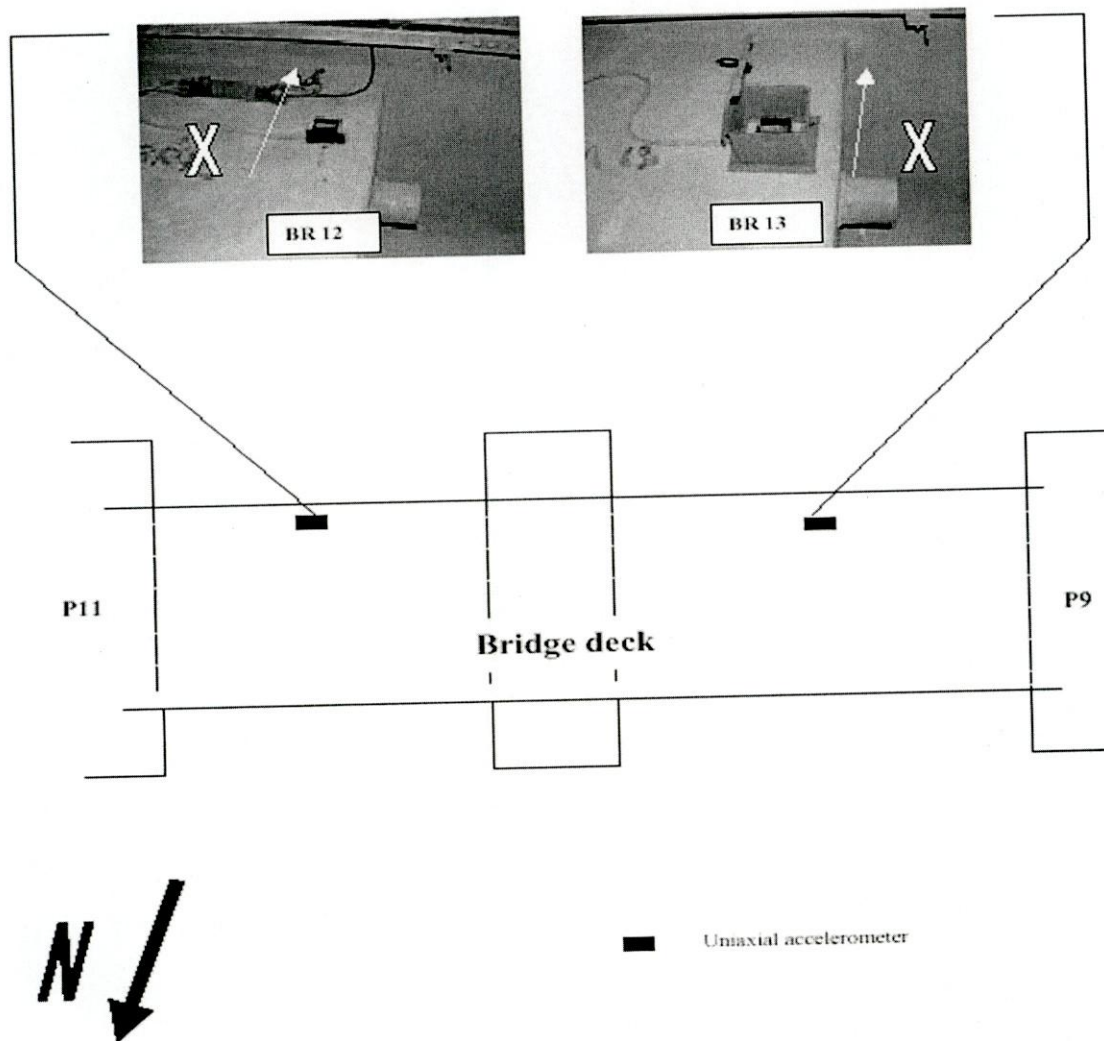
Location of Various Accelerometers at Deck of Jamuna Bridge.
